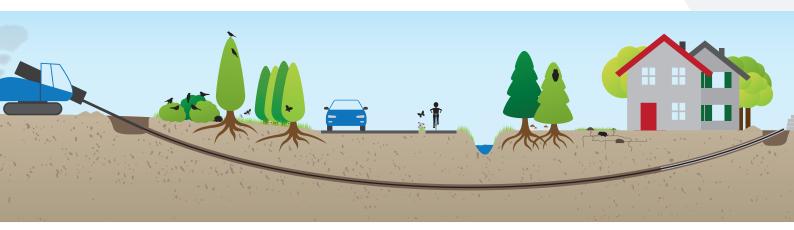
Trenchless pipe laying with the Horizontal Directional Drilling method
